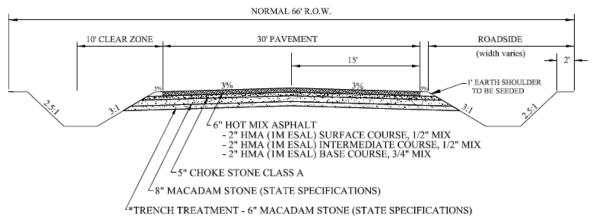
Typical minimum HMA pavement, macadam stone base—open ditch section
